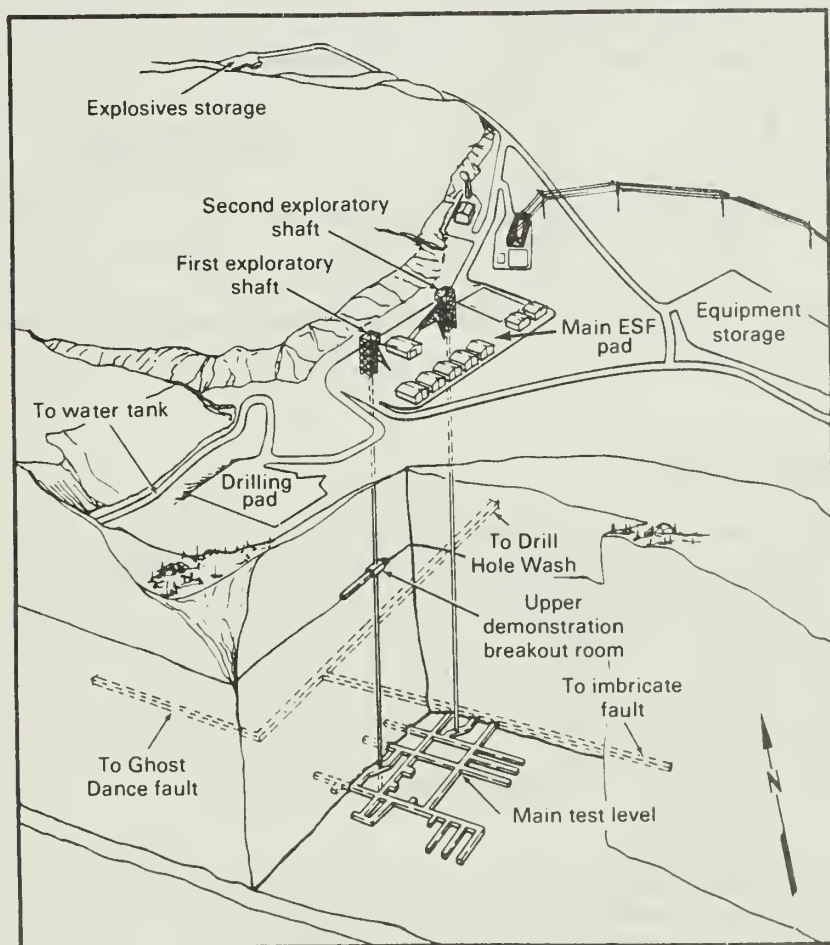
Cutaway view of the exploratory-shaft facility.
